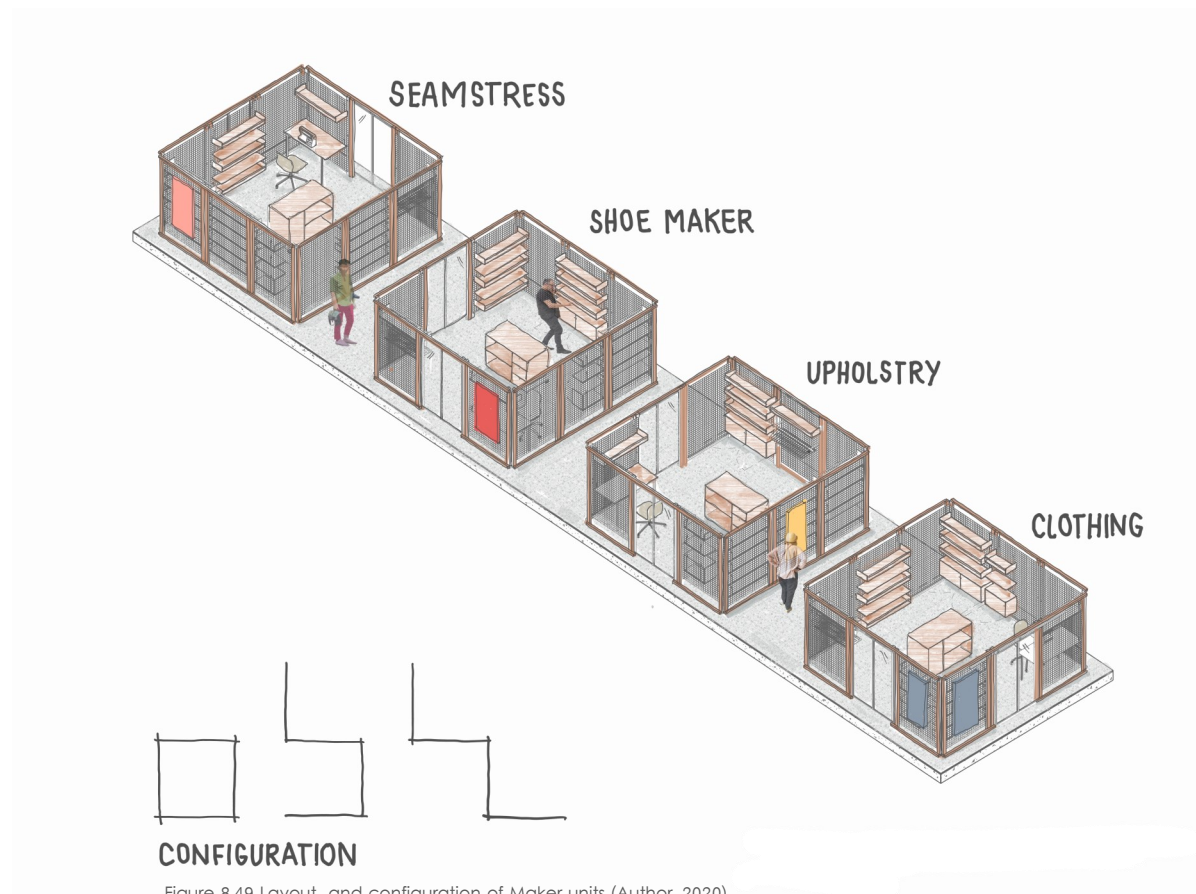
Layout and configuration of Maker units (Author, 2020)
